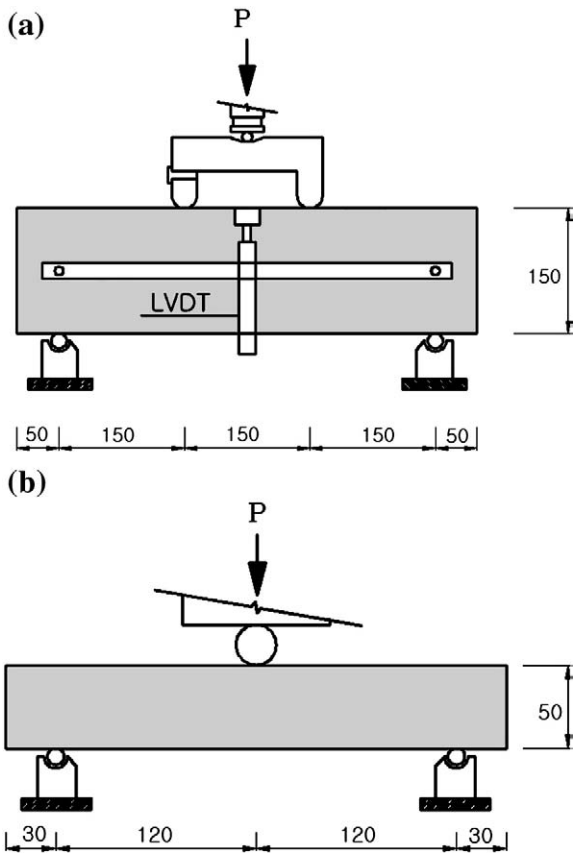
Flexural test arrangements: (a) beam type specimen; (b) panel type specimen.
